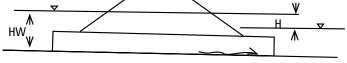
Inlet Control Shown for a Pipe or Culvert
